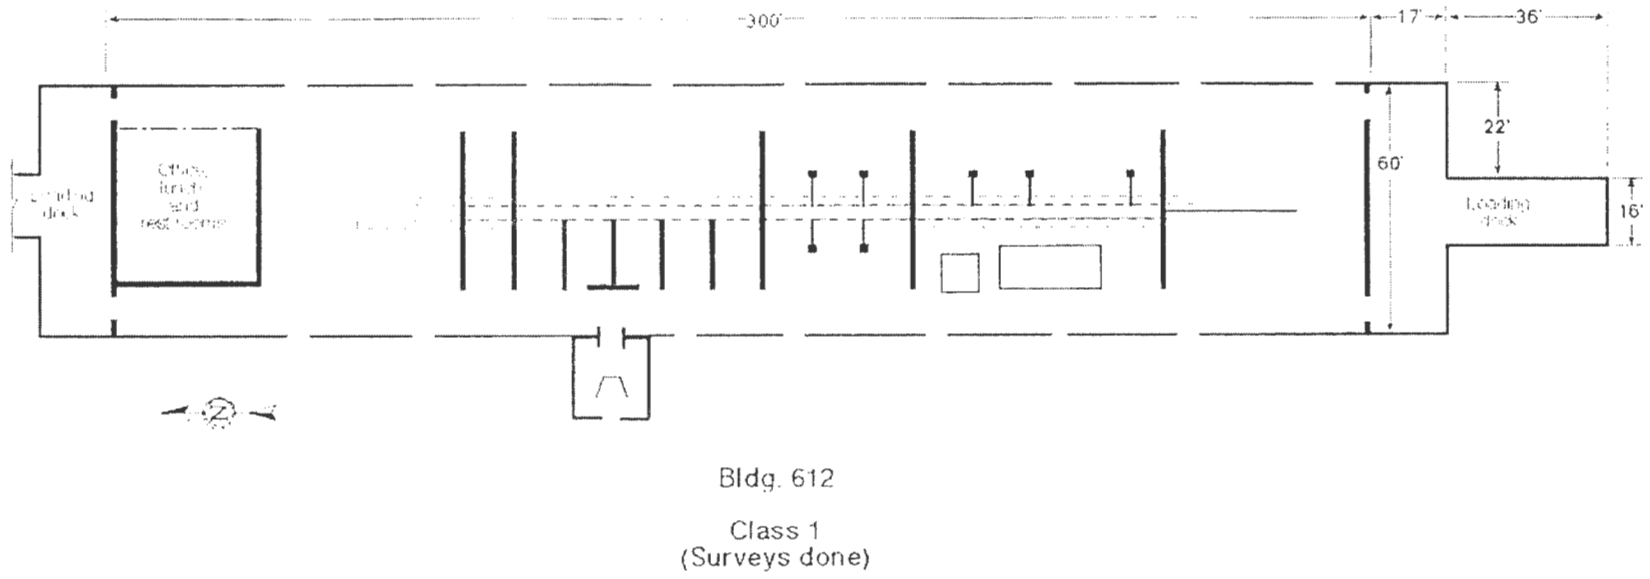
Floor Plan of Building 612 (surveys previously performed in 28 Class 1 survey units)
